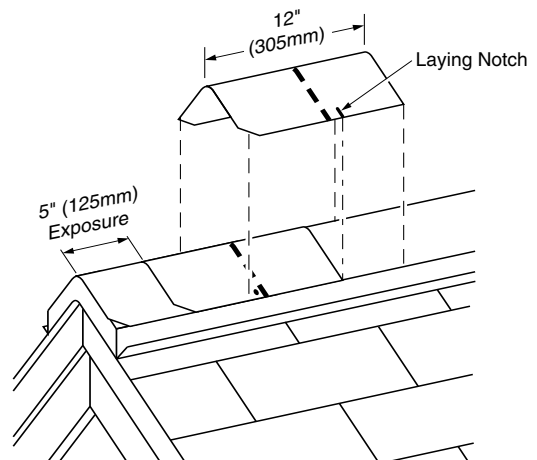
Use laying notches to center shingles on hips and ridges, and to locate the correct exposure.
